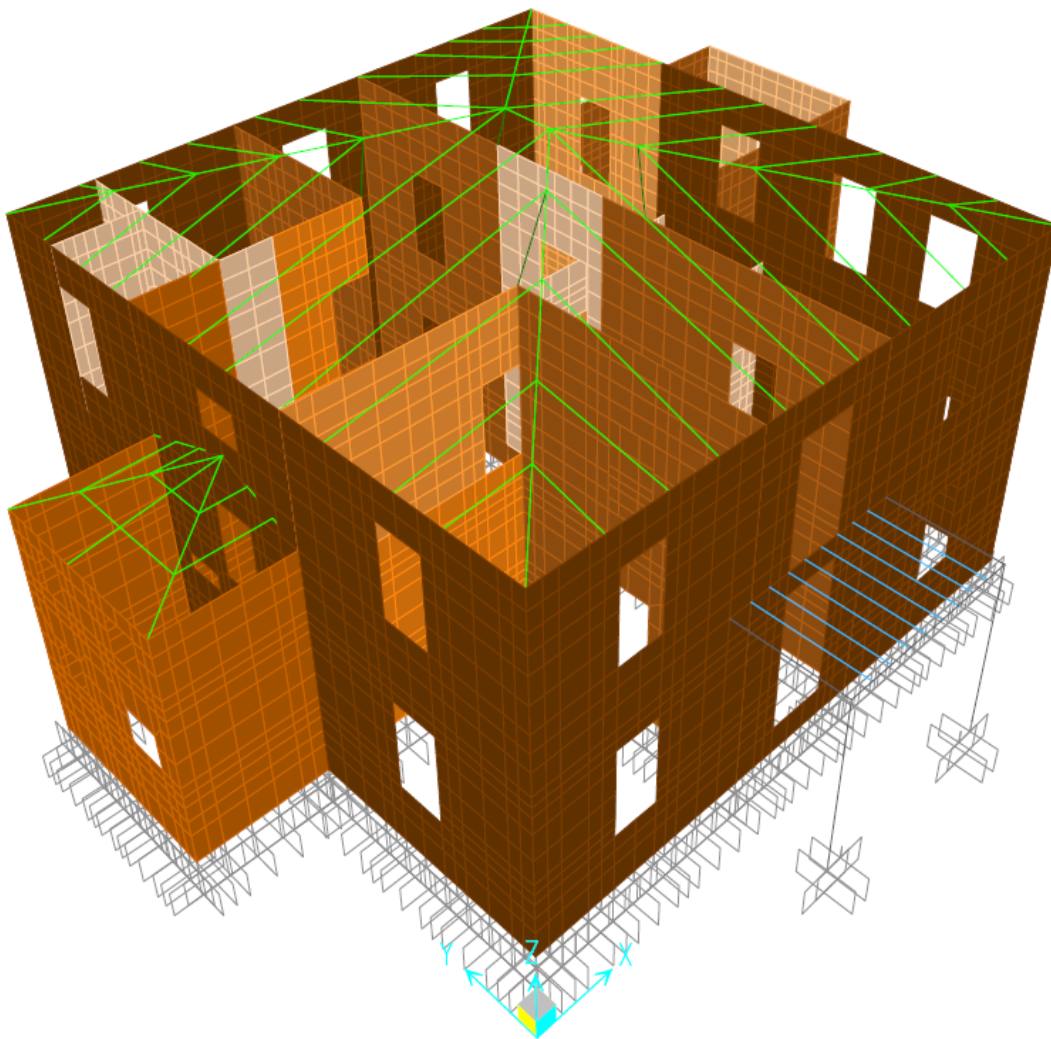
Southwest building façade – Colors on the model are based on material and thickness of the profiles
